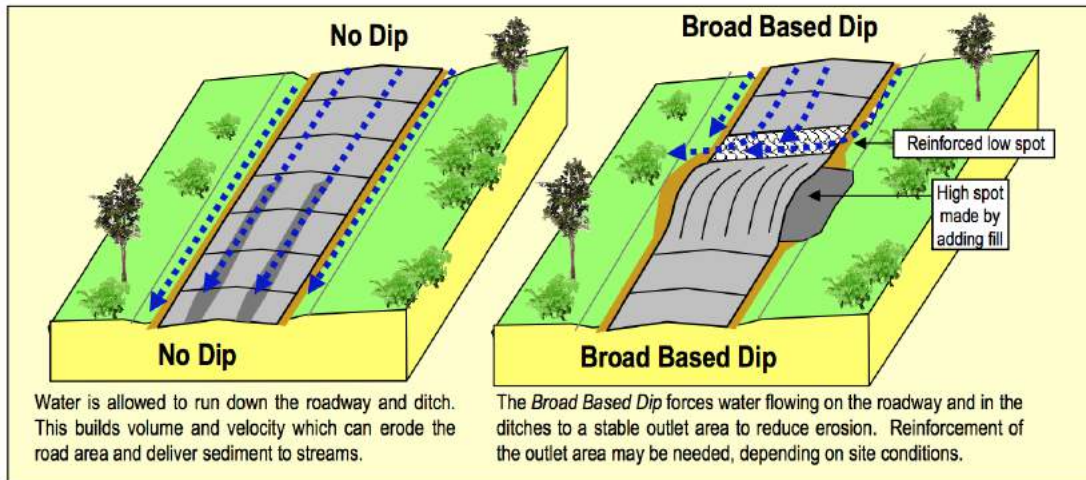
Broad Based Dips or Rolling Dip used to convey water off roadway or trail (PSU Center for Dirt & Gravel Studies, 2017)
